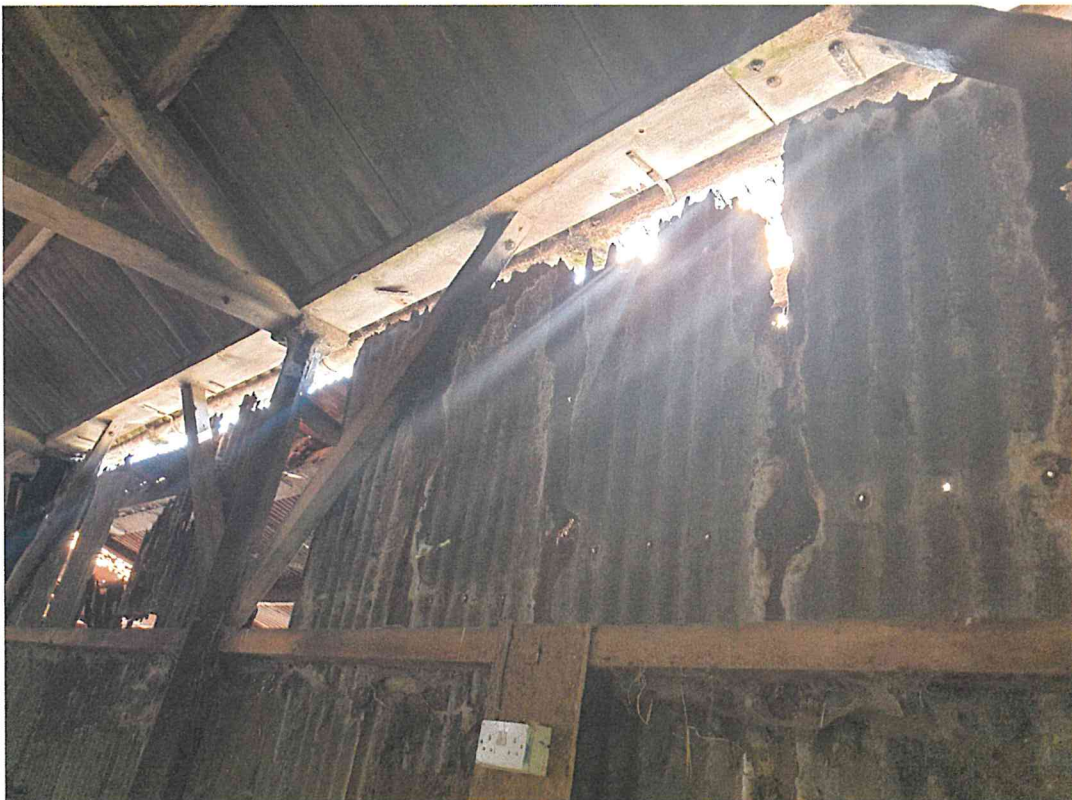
TYPICAL VIEW ON THE WALL CLADDING
